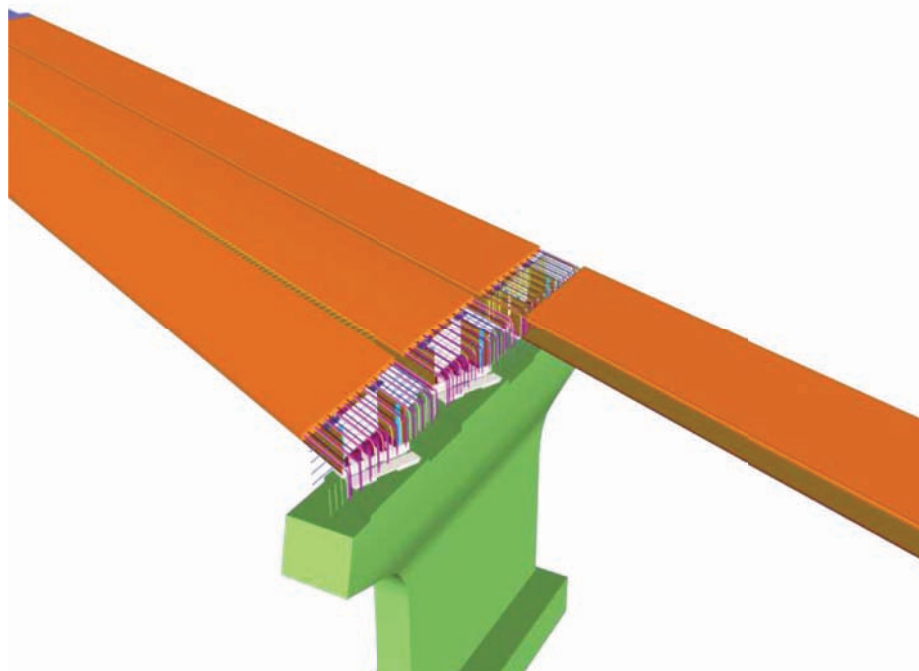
Conceptual drawing of SDCL system using pre-topped and adjacent girder concepts.
